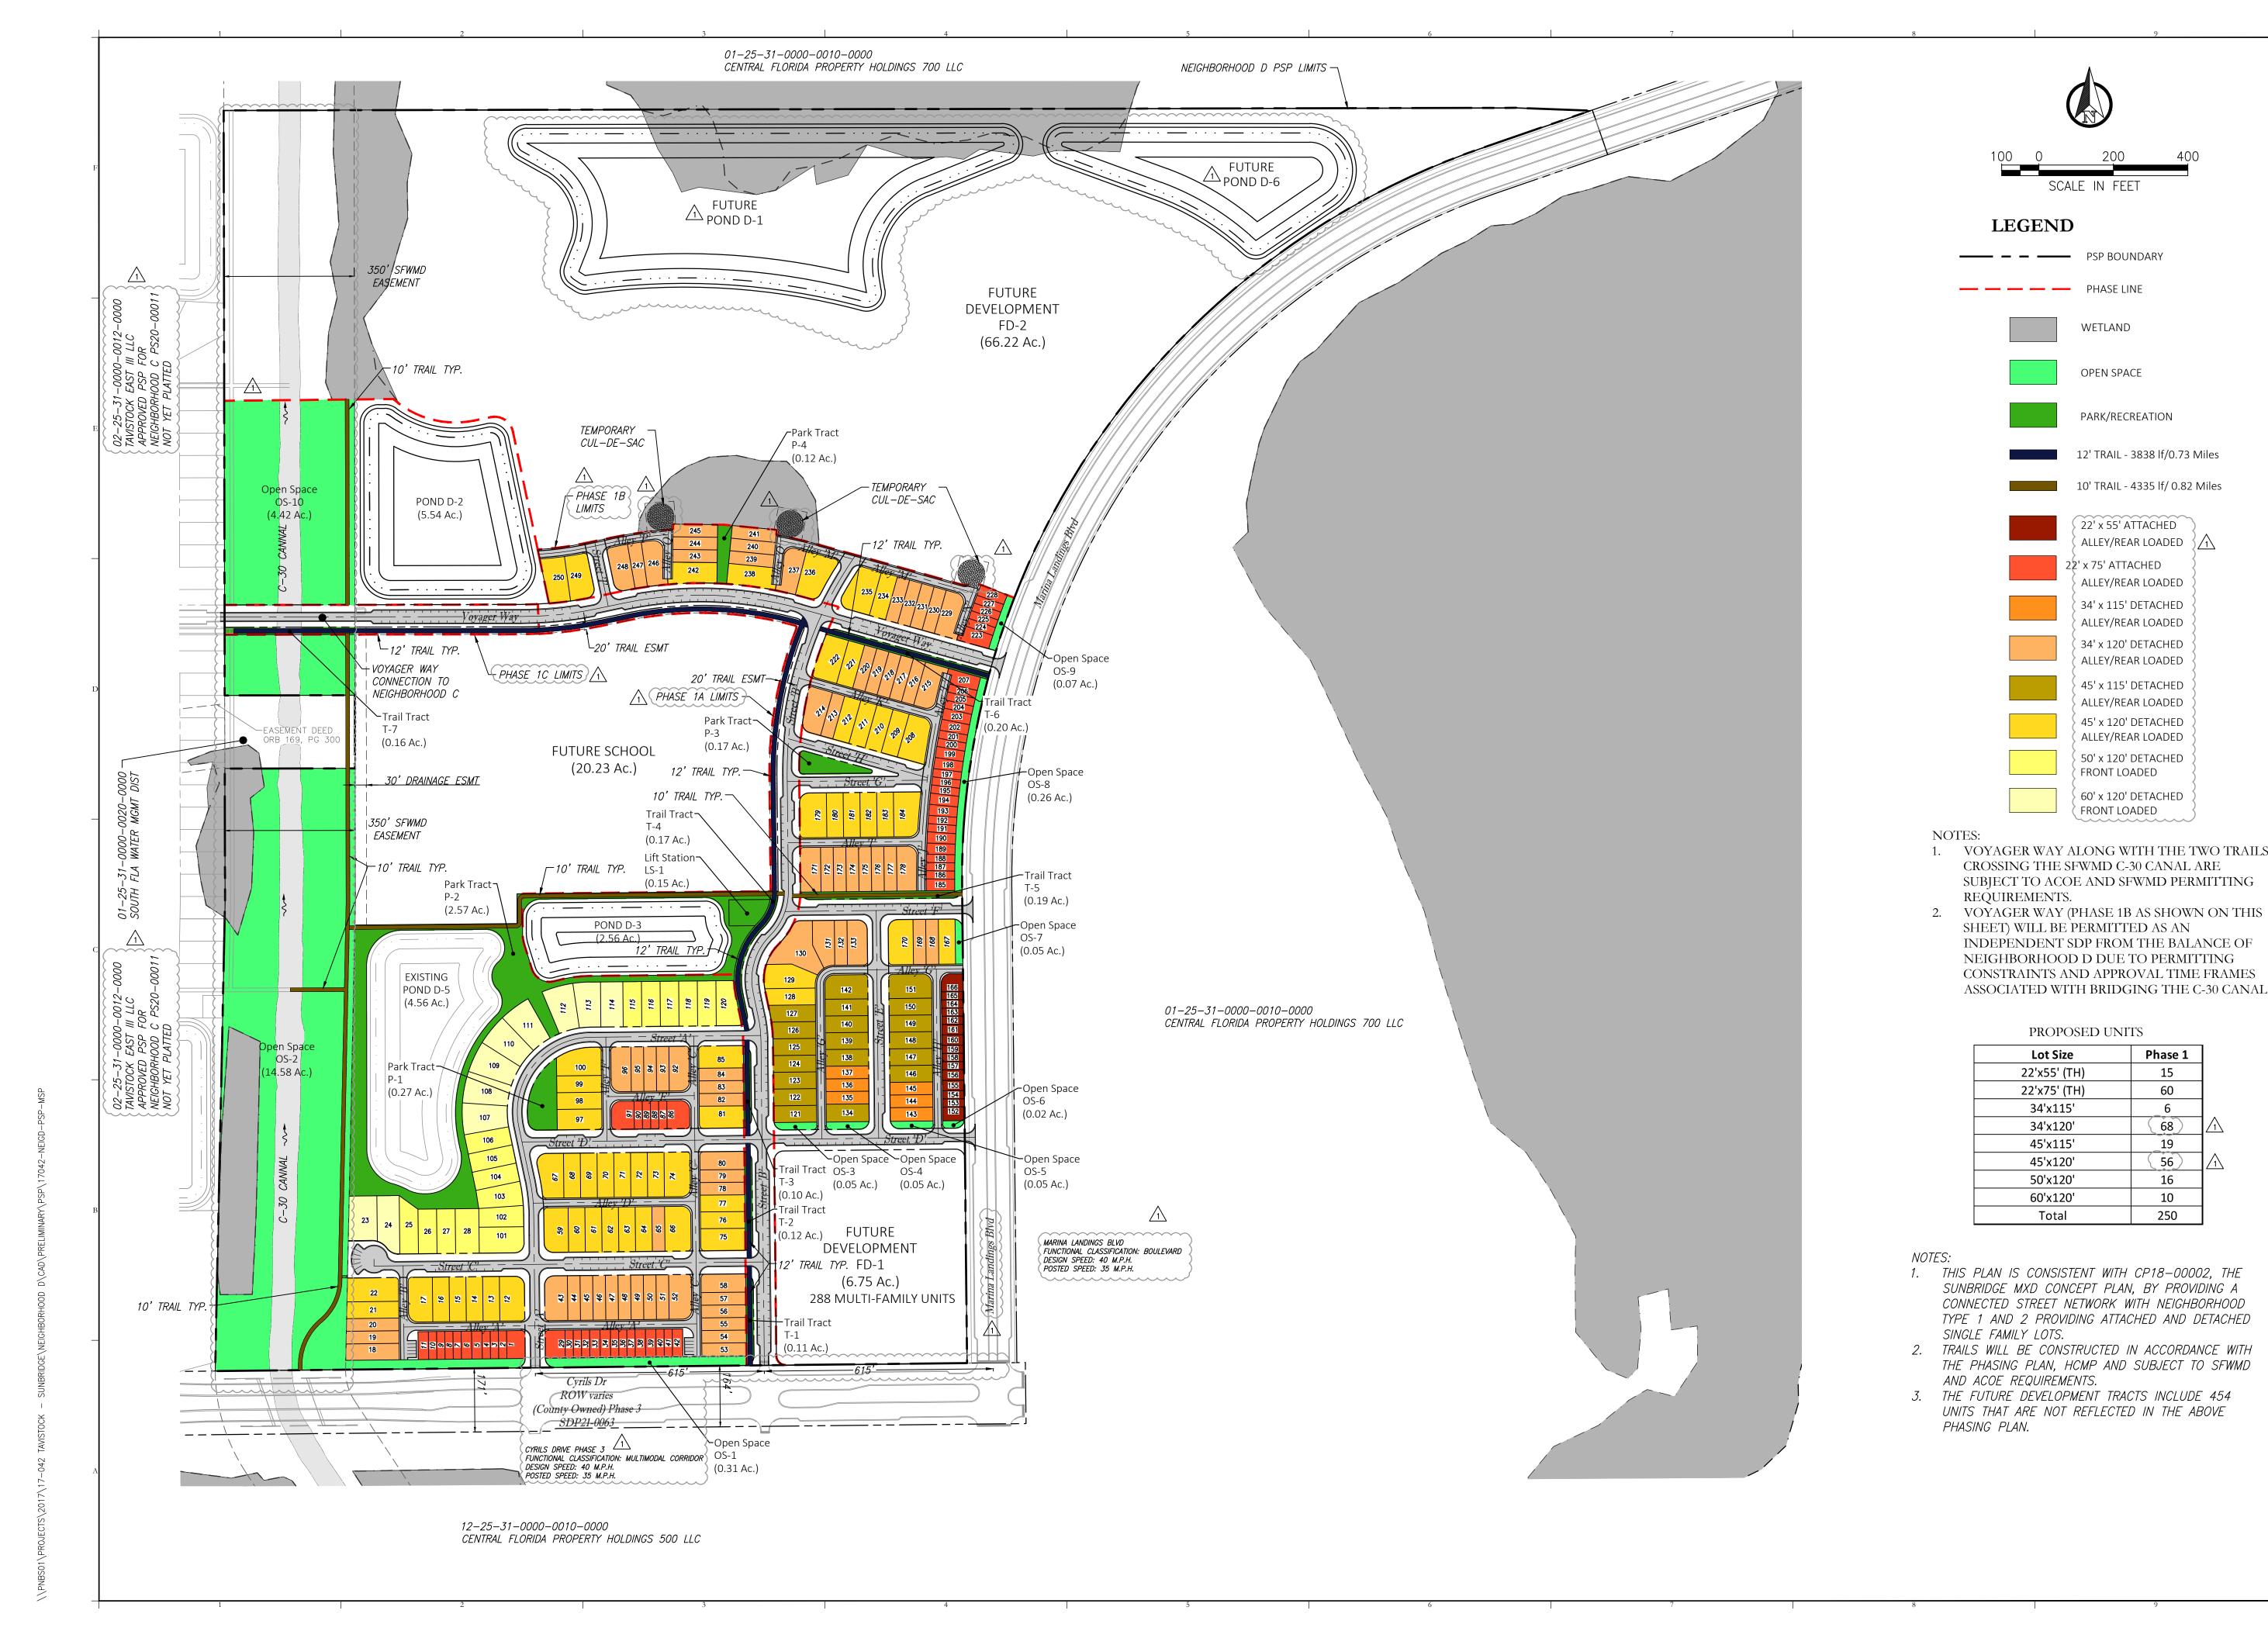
NEIGHBORHOOD C APPROVED PSP SITE PLAN
